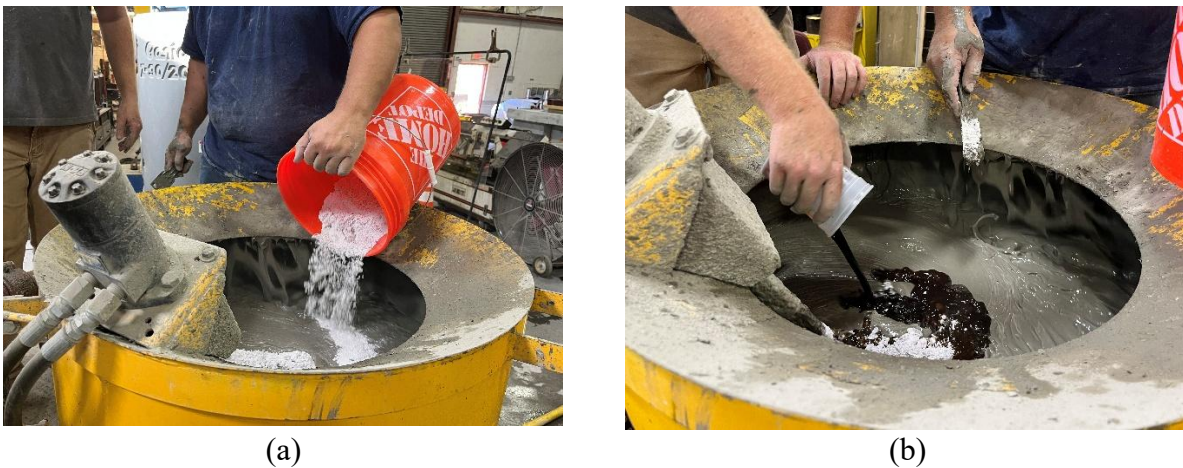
Legacy grout mixing in the grout plant: (a) Adding Intraplast N admixture into the grout mix; (b) Adding WRDA 60 water-reducing admixture into the mix.
